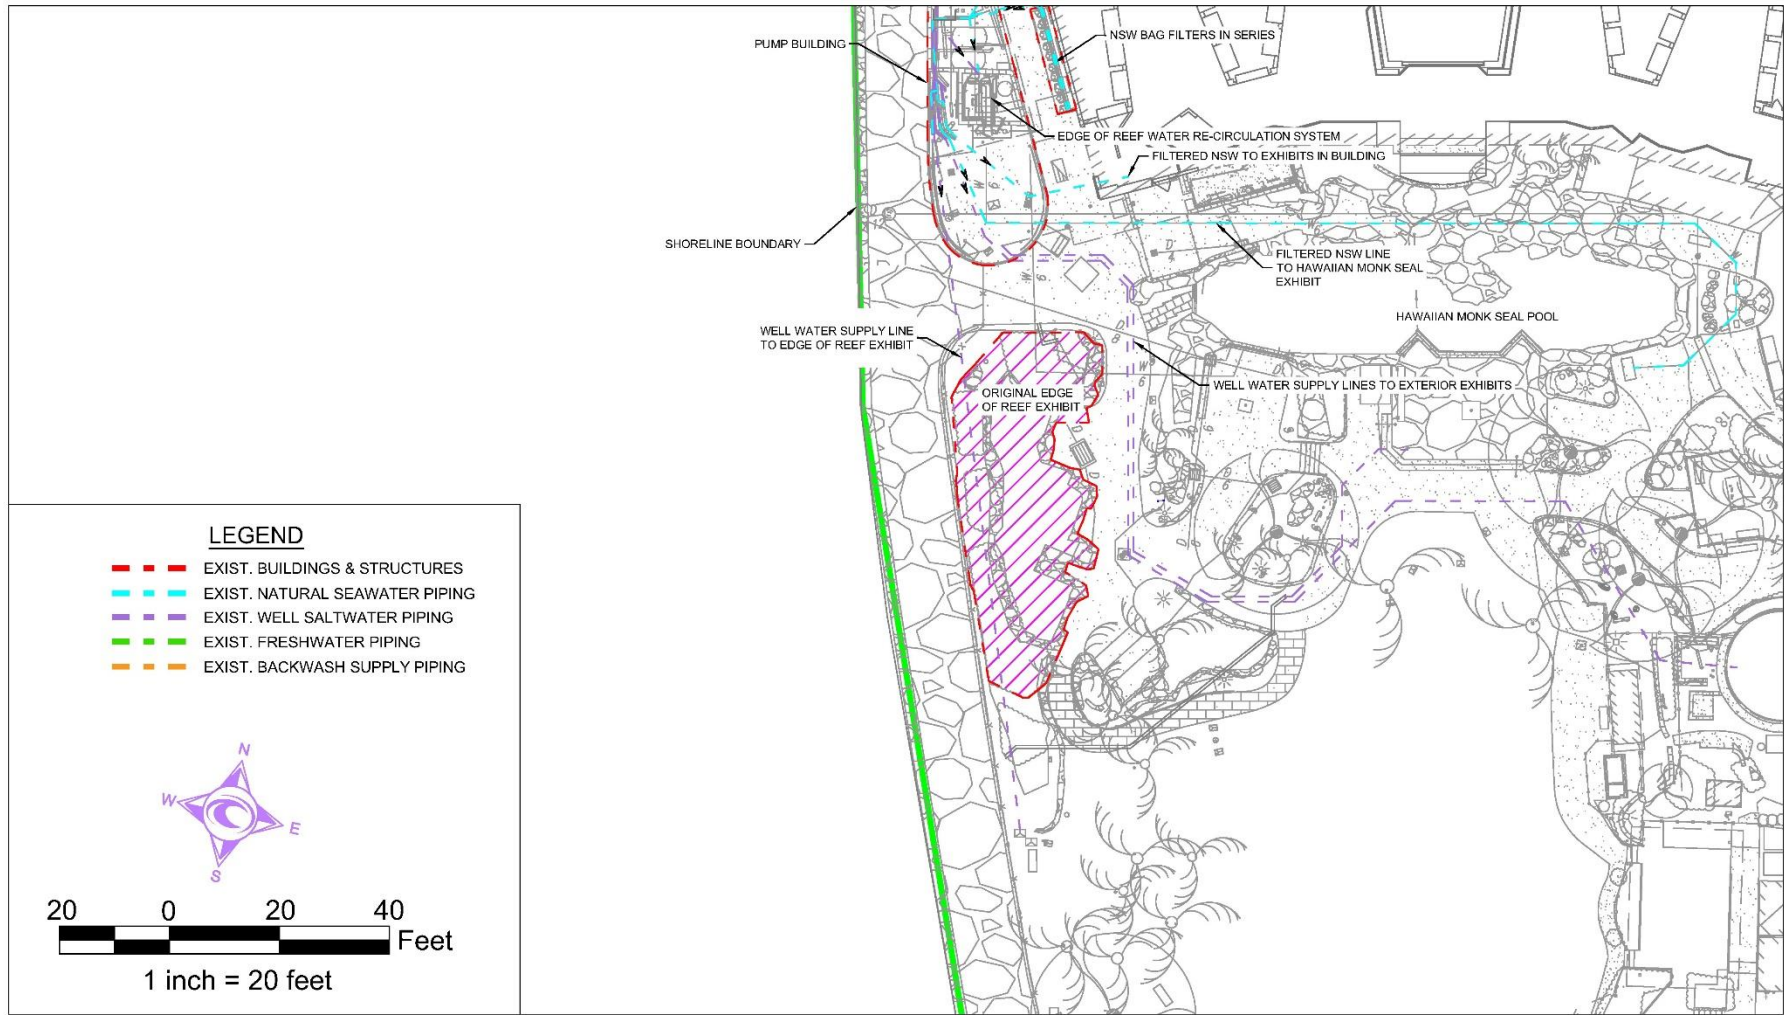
b: Original Edge of Reef Exhibit Existing Conditions
